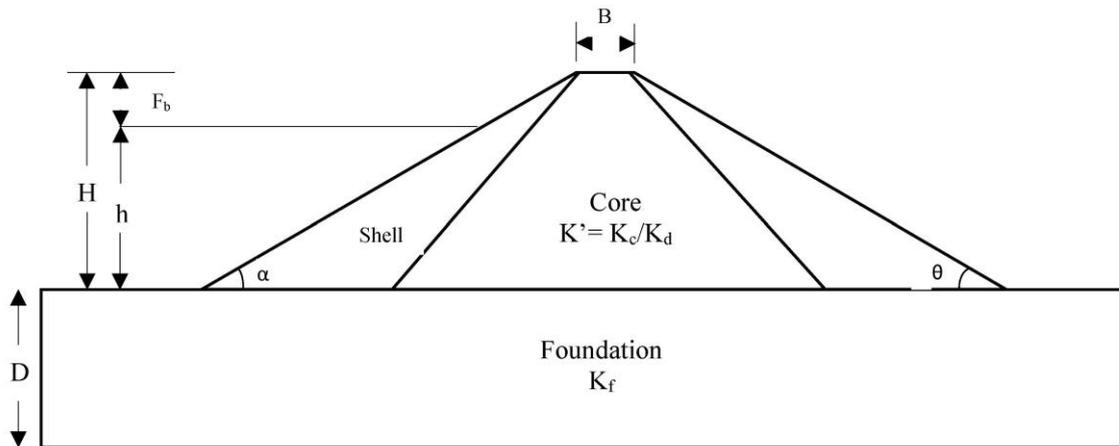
General cross section of the earthen dam model laying on pervious foundation
